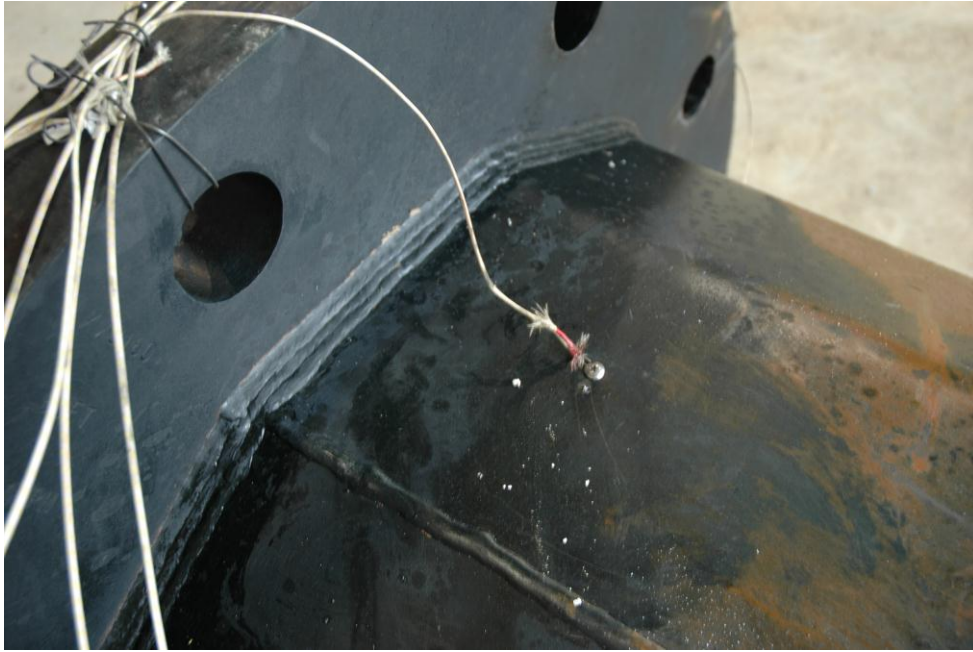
Screw thermocouple connection at HMIP shaft location
